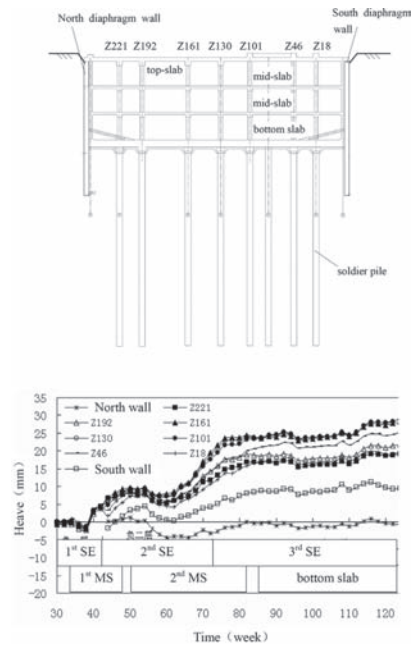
Profile of excavation using top-down construction and monitoring data showing heave of diaphragm walls and piles (n.b. SE = staged excavation, MS = mid-span construction) (from Zheng and Li).
